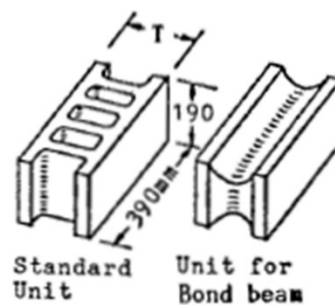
Concrete blocks used by Matsumura (1987) for PG walls
